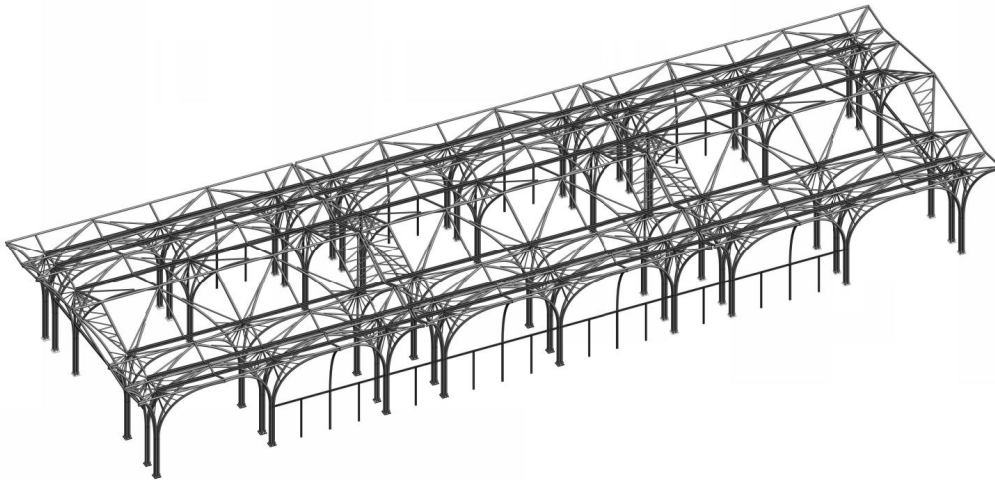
A 3d view of the Piotrskowska Central Tram Station structure (from the Building Permit stage).
